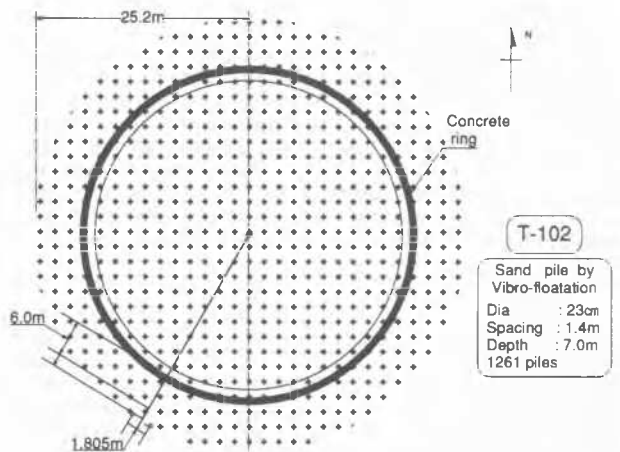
Plan views of the ground improvement scheme for the cylindrical Tank102
